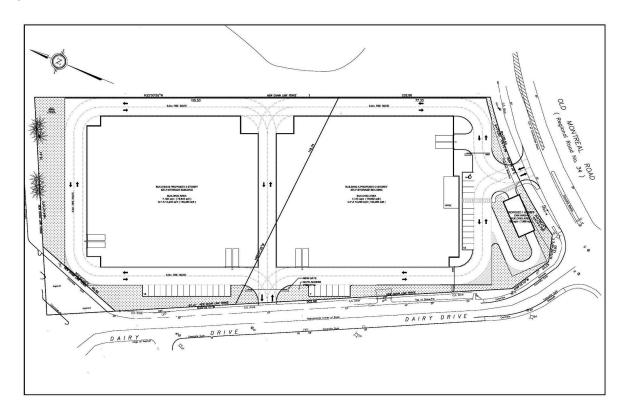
Site plan iteration with slightly different building footprint/ floor plan and a carwash.
